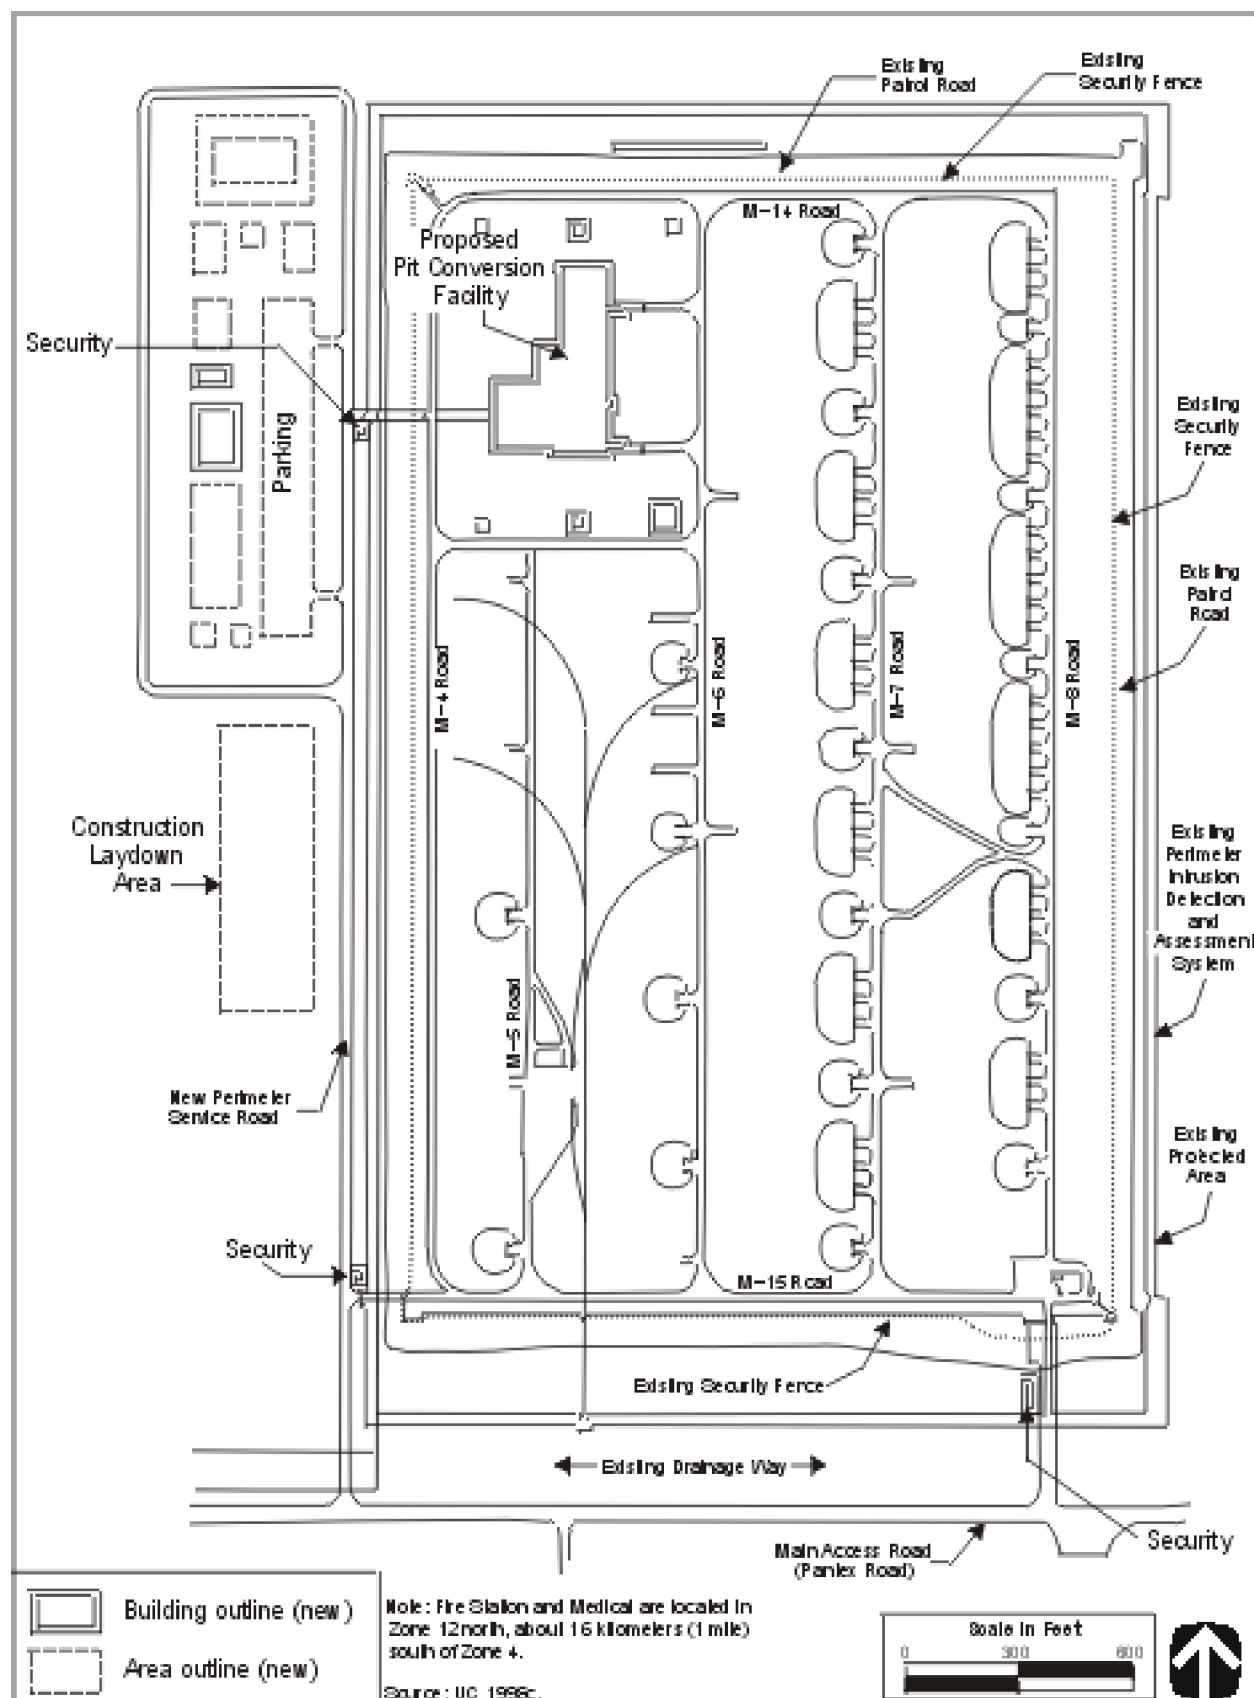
Proposed Pit Conversion Facility Location in Zone 4 West at Pantex
